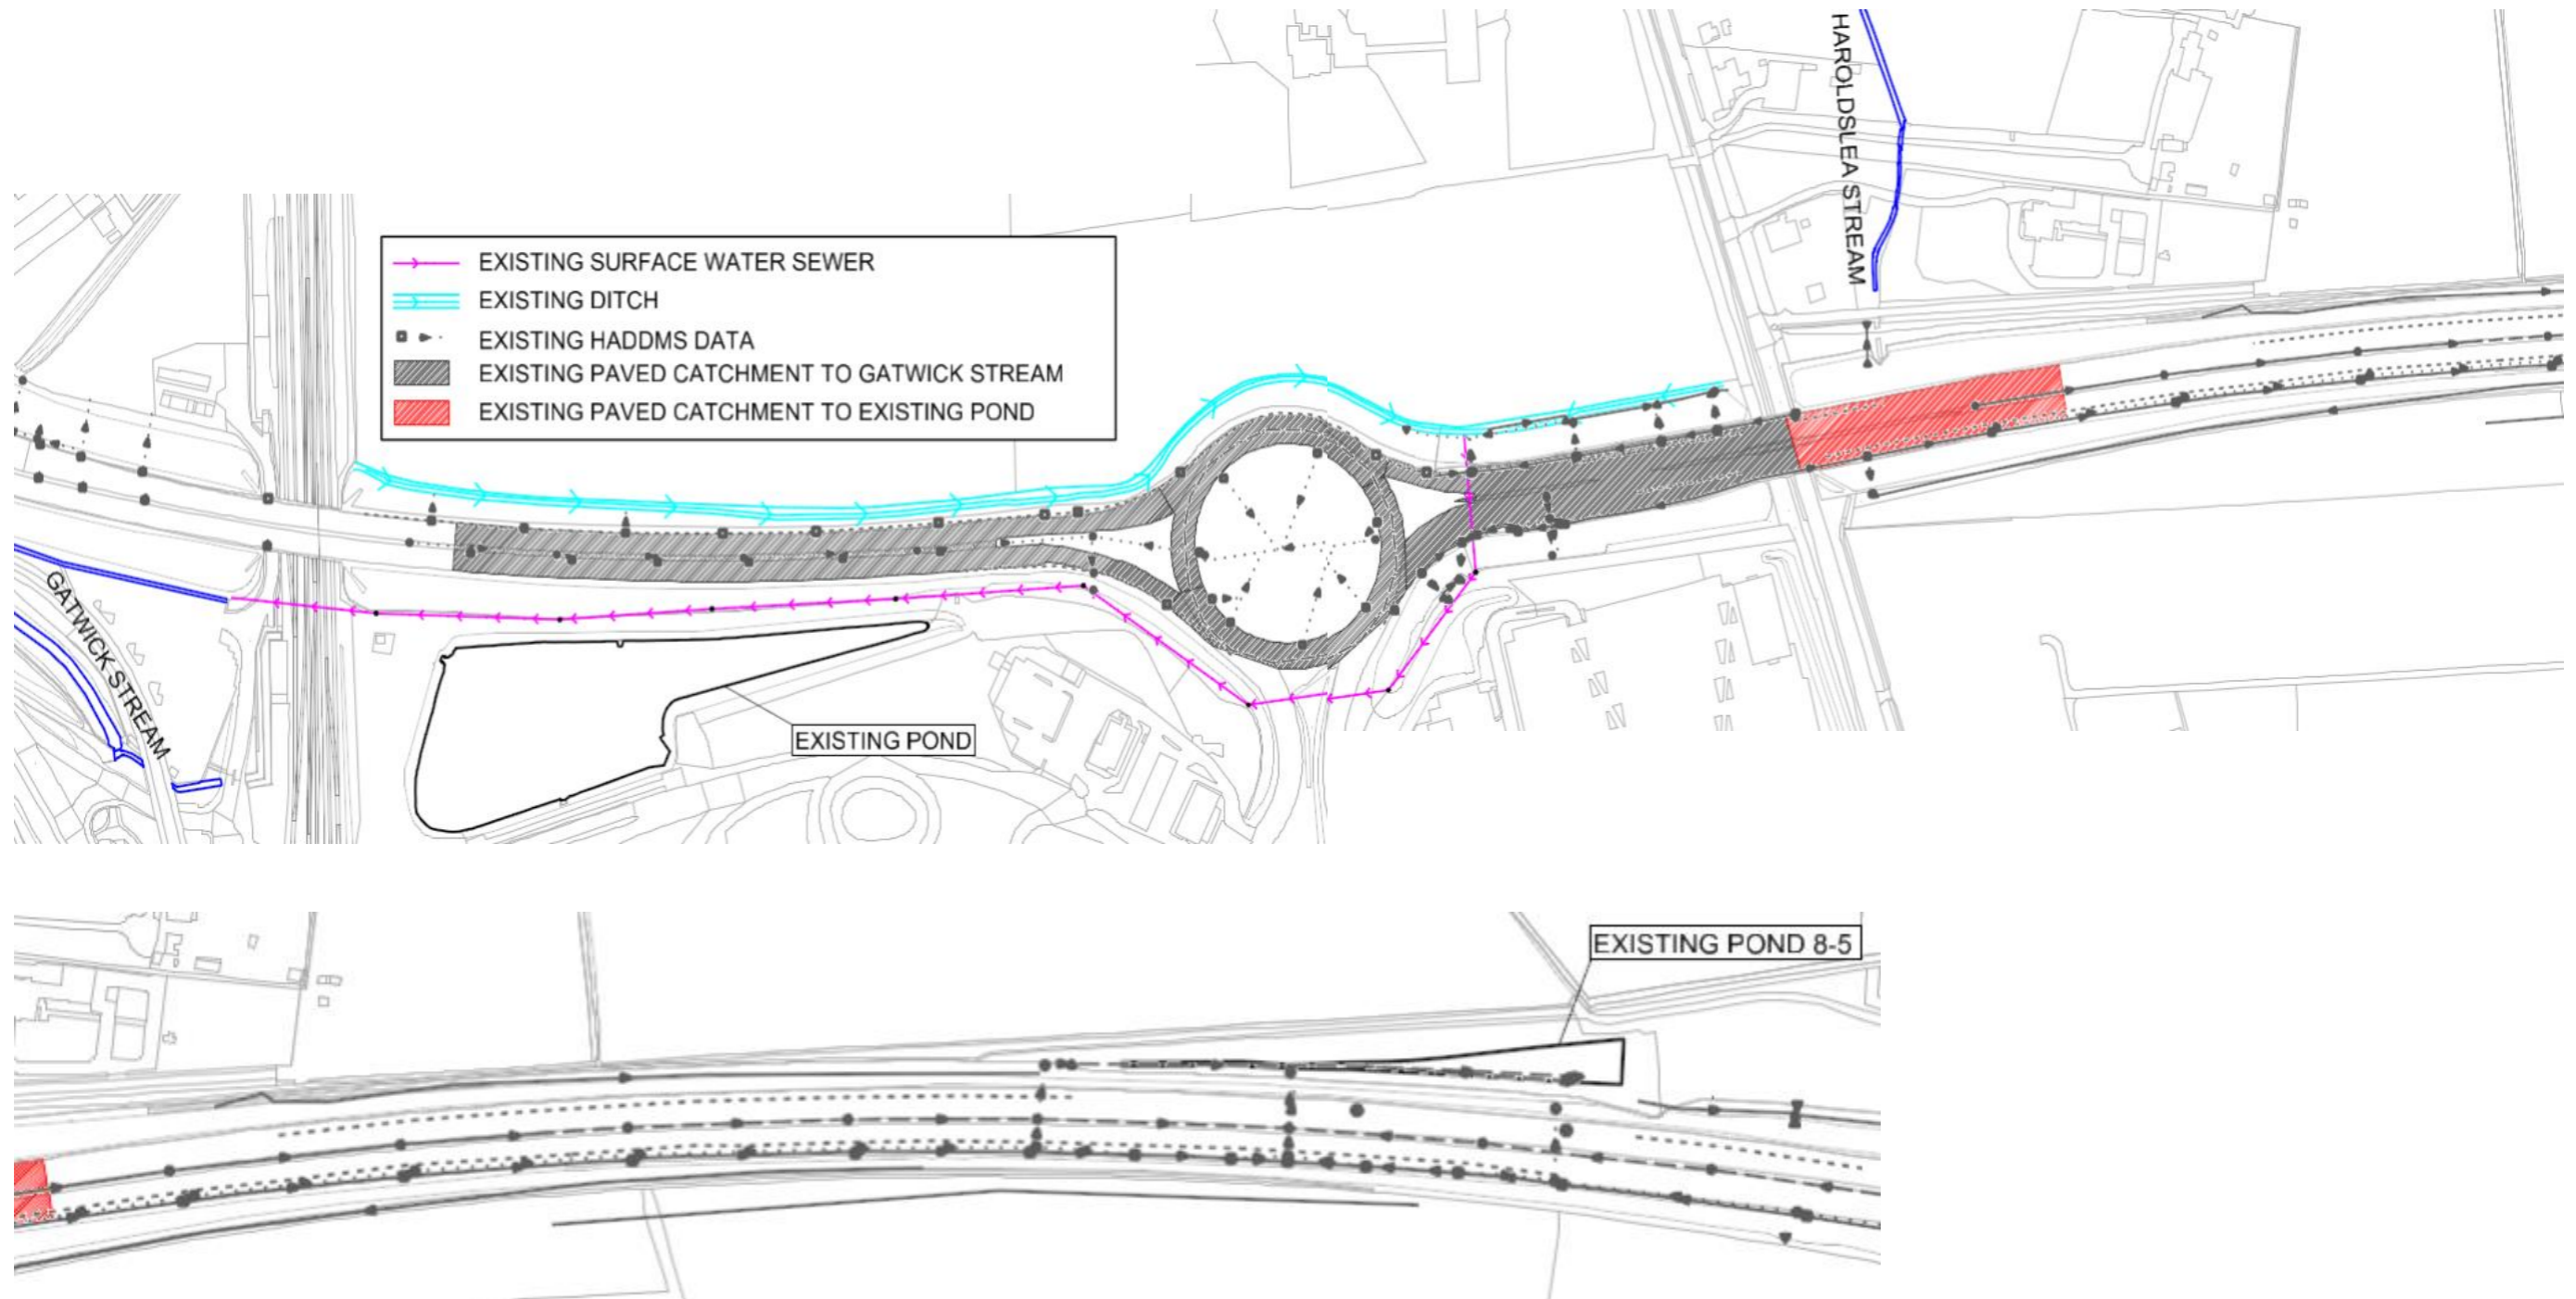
Existing North Terminal Roundabout Highways Drainage Layout
